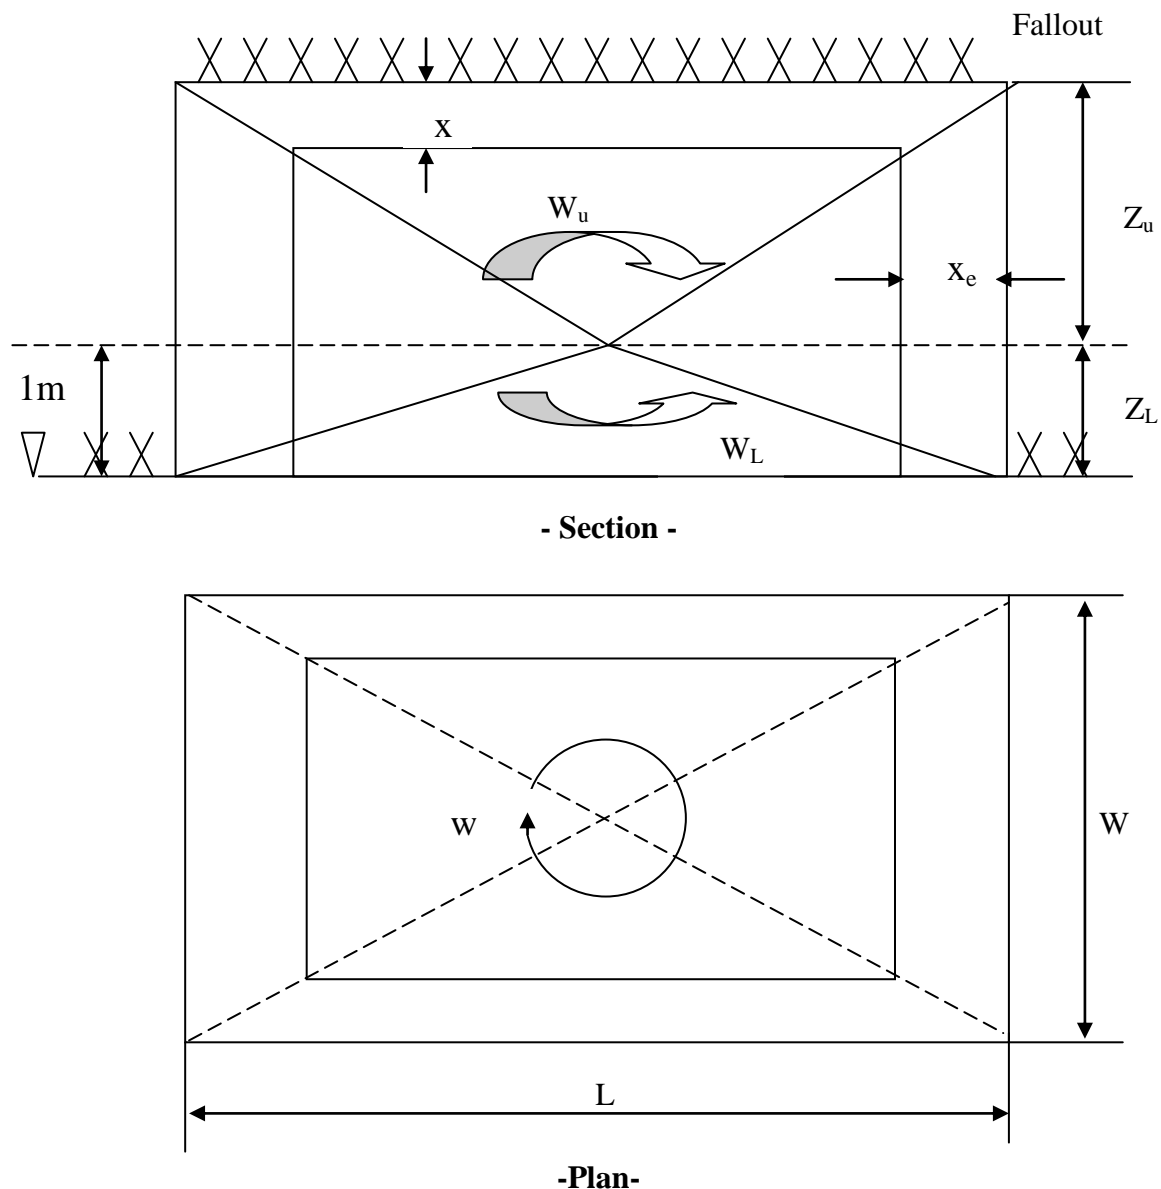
Section and plan views of a typical shelter <sup>[6]</sup>
